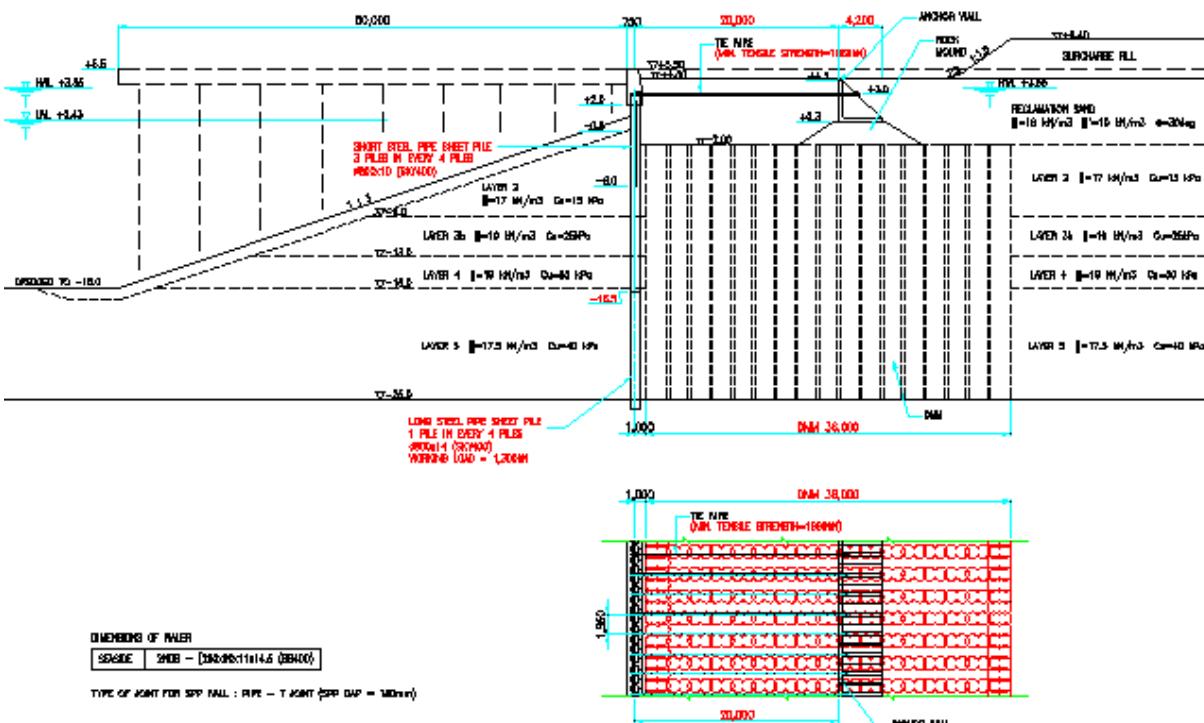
Typical Cross Section of Earth Retaining Wall (behind Container Berth)
